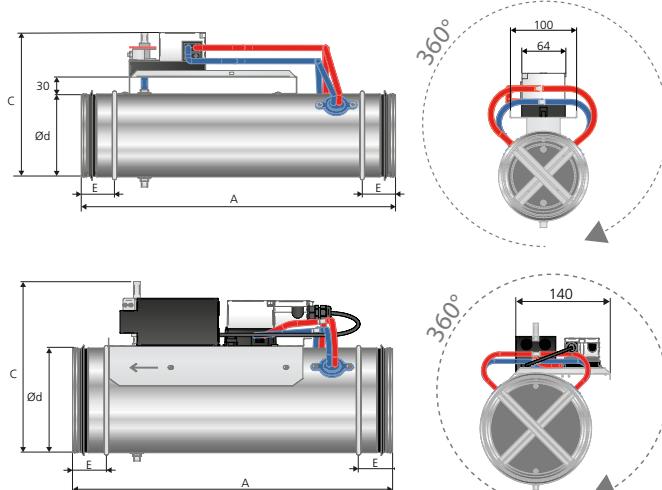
Dimensions (mm), REACT V circular and REACT V circular with spring return. The damper can be installed at an optional angle.
